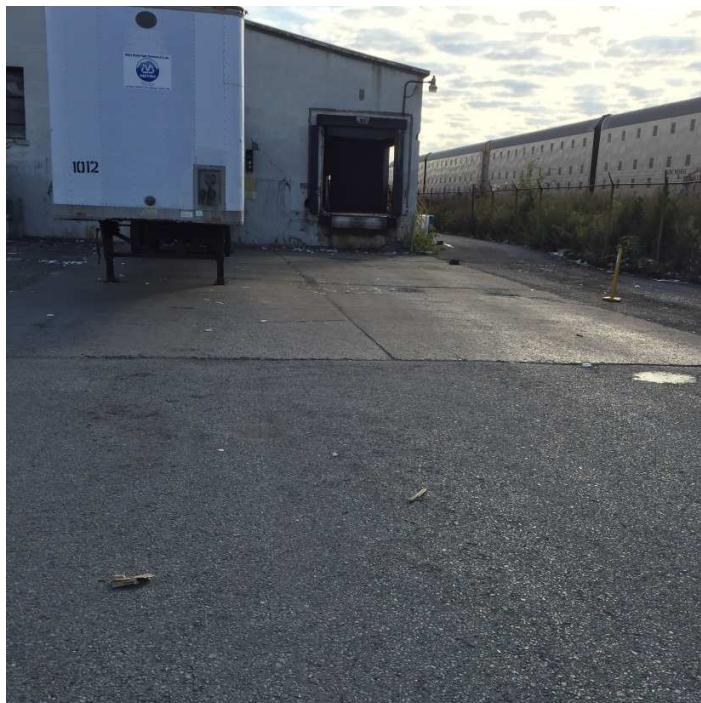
Building Apron Concrete System (south end of building) looking east.
